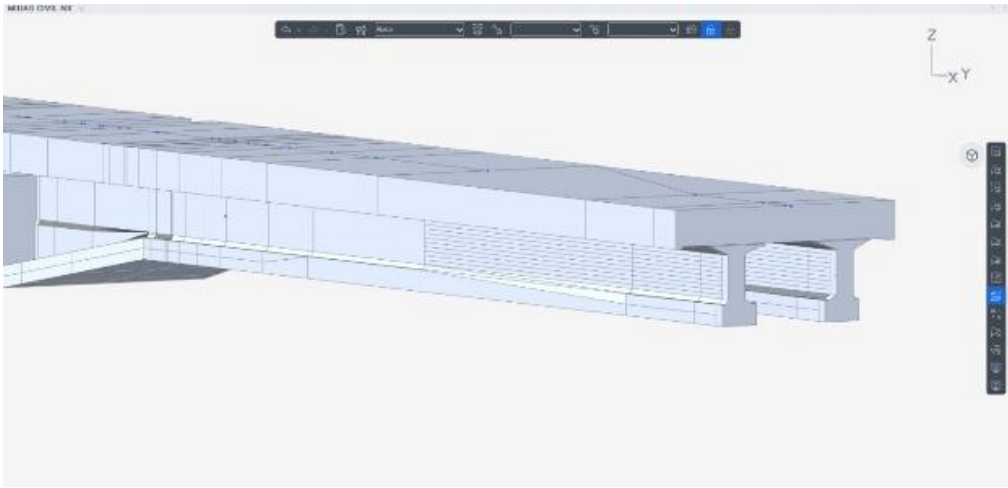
Midas Civil model: perspective detail of the variable-section beam.
